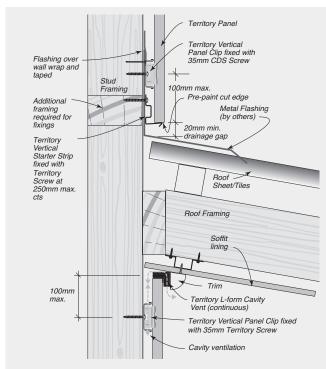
Junction with External Roofing (Flat Roof Corrugate)
